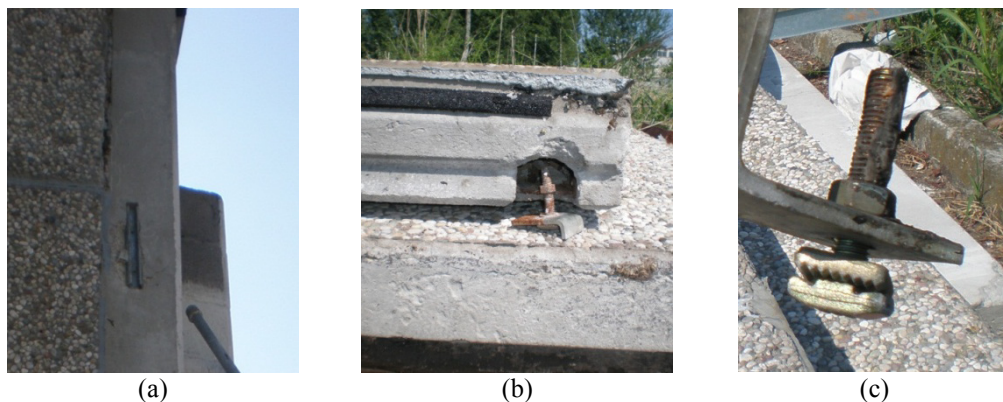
Details of a connection device at the top of horizontal panel: (a) anchor channel embedded in the column, (b) steel angle plate and (c) hammer head screw out of the anchor channel
